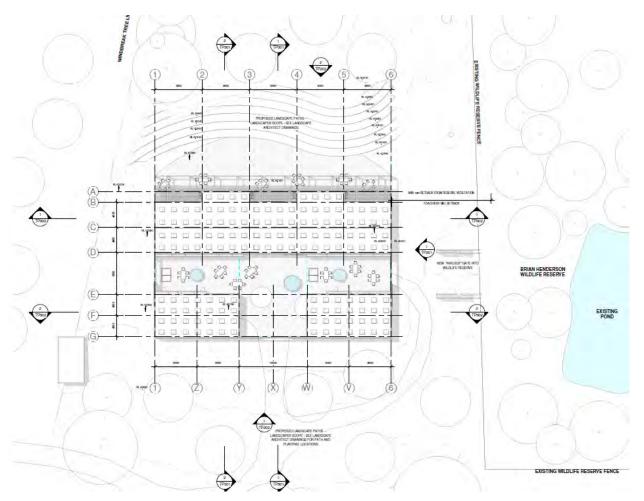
Excerpt from proposed Site Plan (Dwg. No. TP050, Rev. G). (McIldowie Partners, 5 September 2023).
